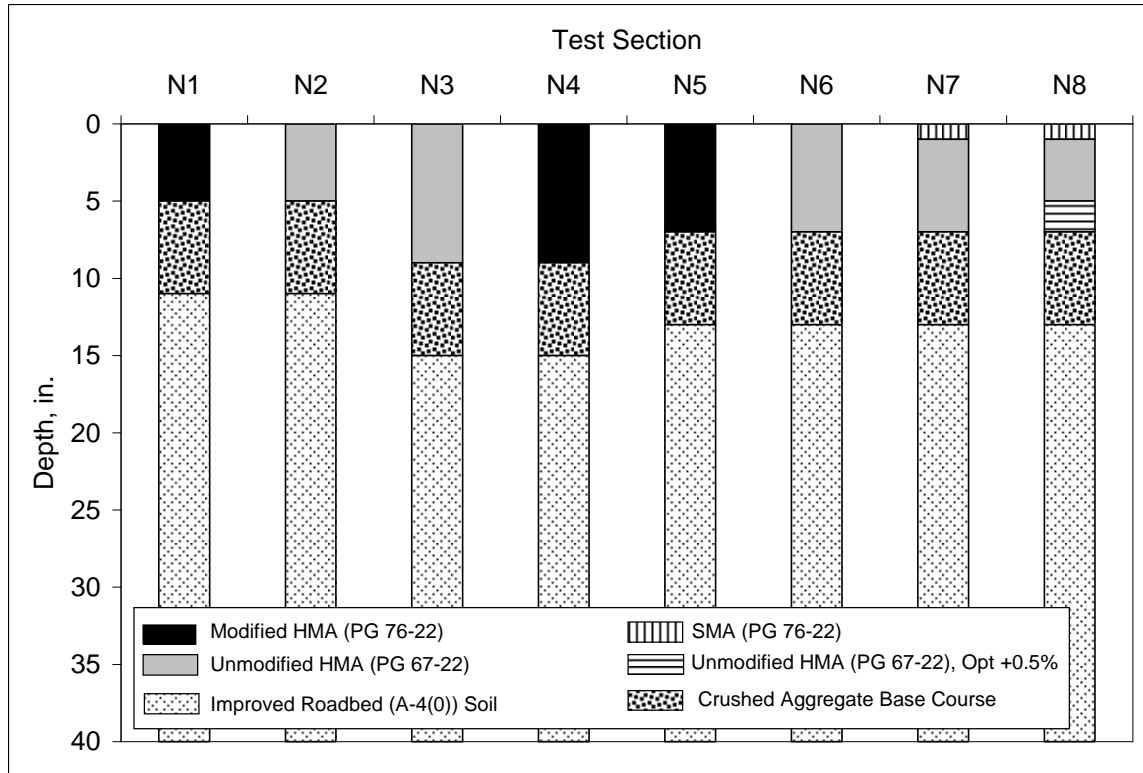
2003 Test Track Structural Sections (Timm et. al, 2004).
